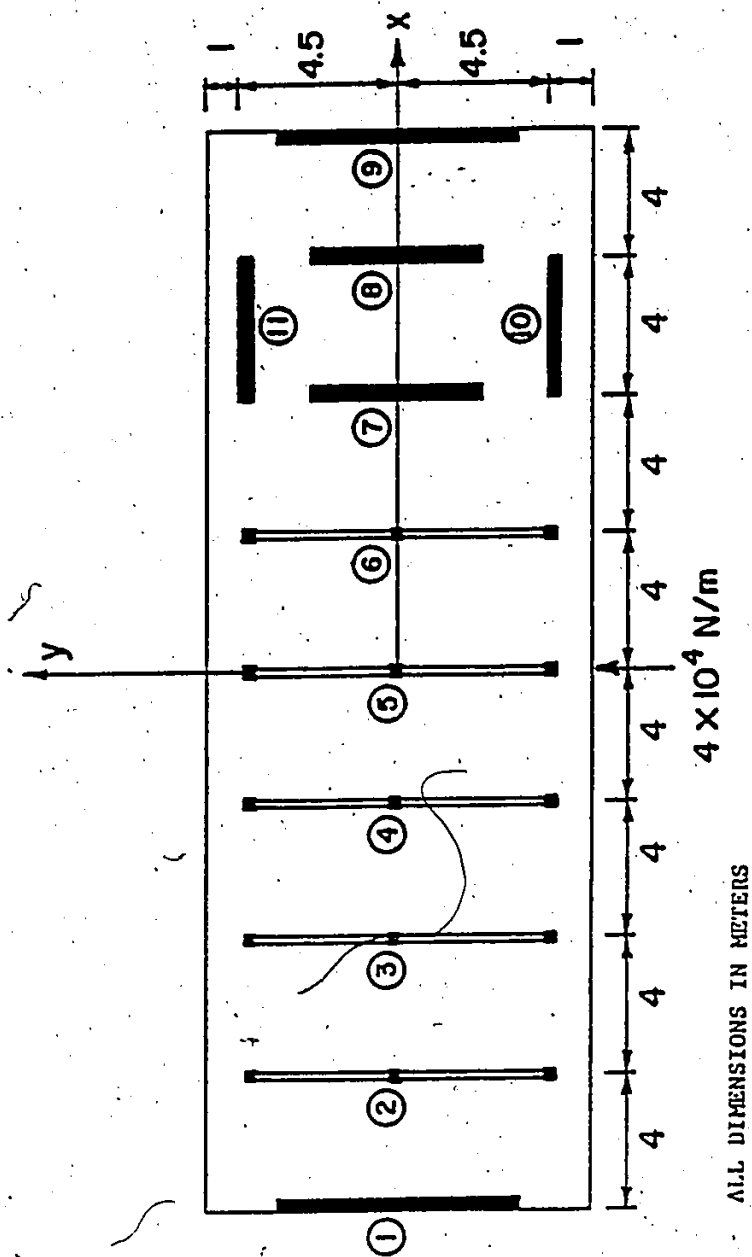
Framing Plan of the 8, 16 and 32 story Wall-Frame Building
